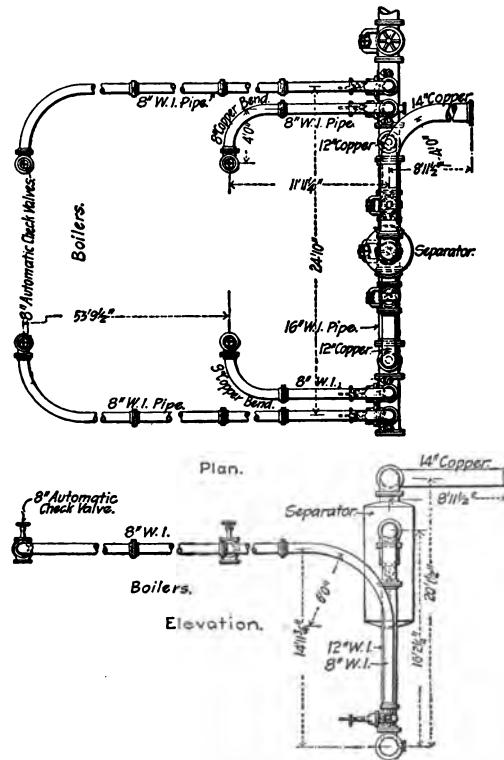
Section Main Steam Piping, Lincoln Wharf Station.
